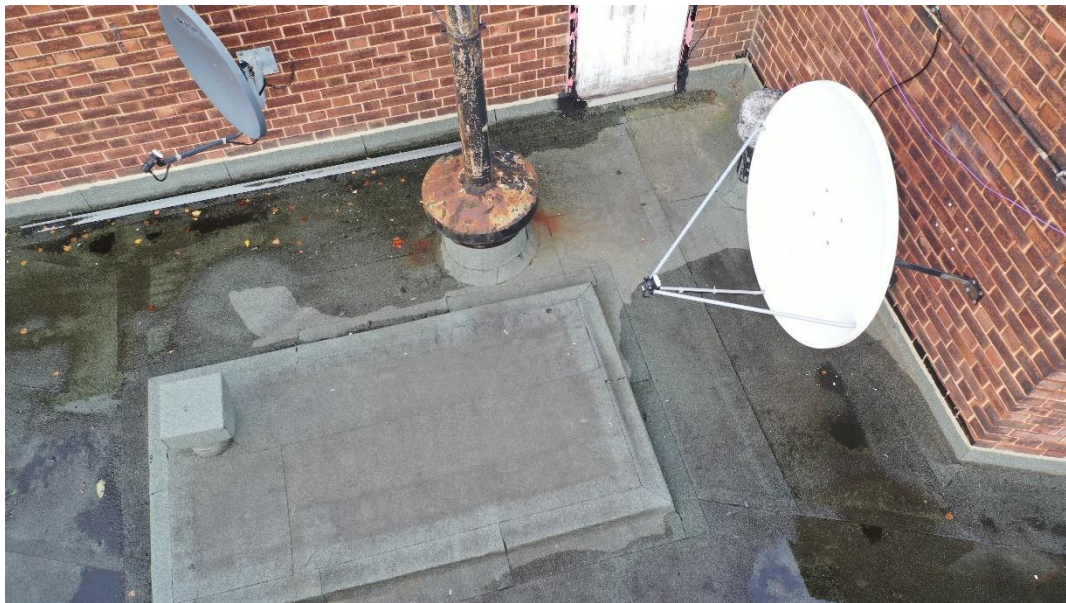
The small triangular flat roof in front of the door into the lean-to structure at the north-eastern corner of the roof.
